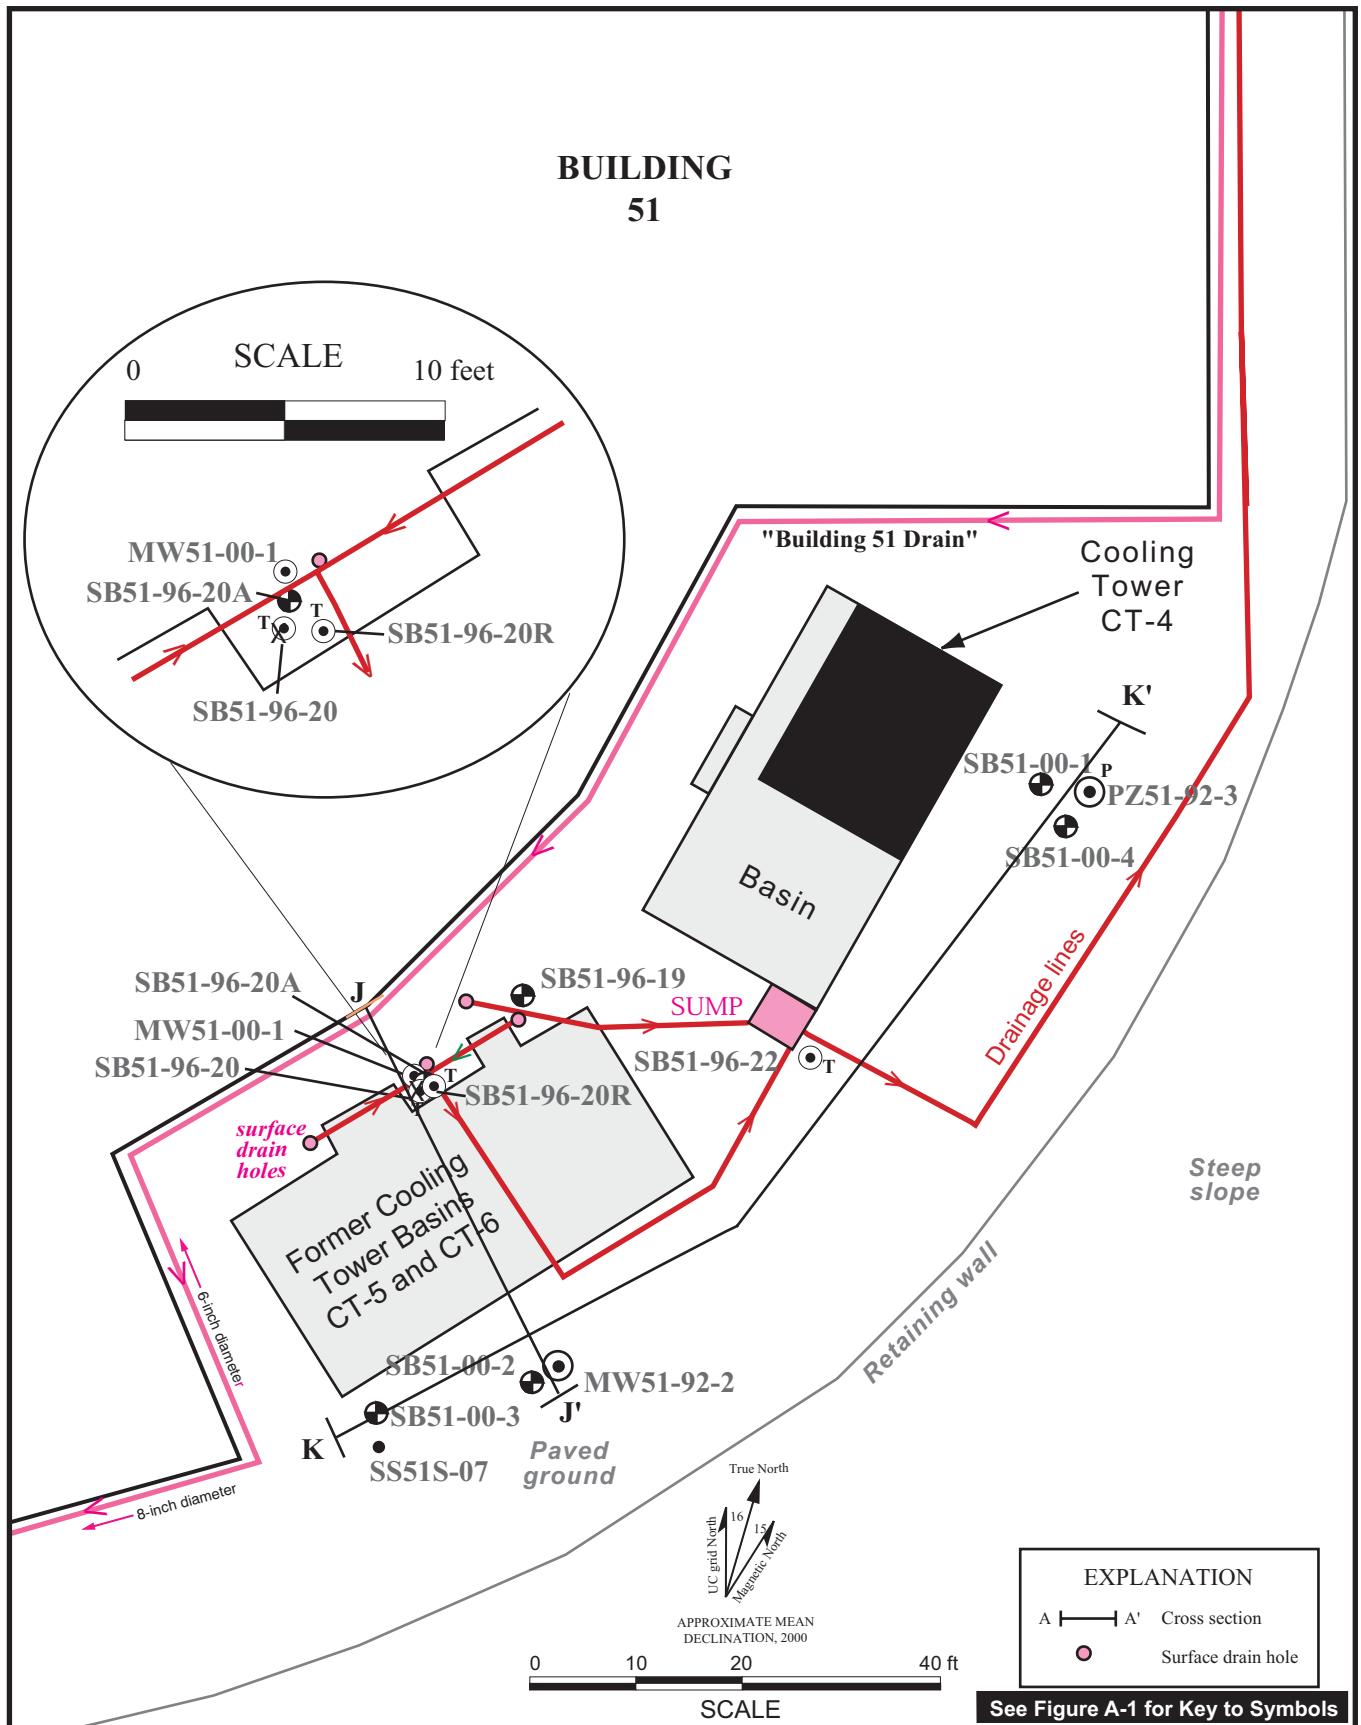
Soil Boring and Cross Section Locations, Former Cooling Towers Southeast of Building 51 (AOC 9-11).
